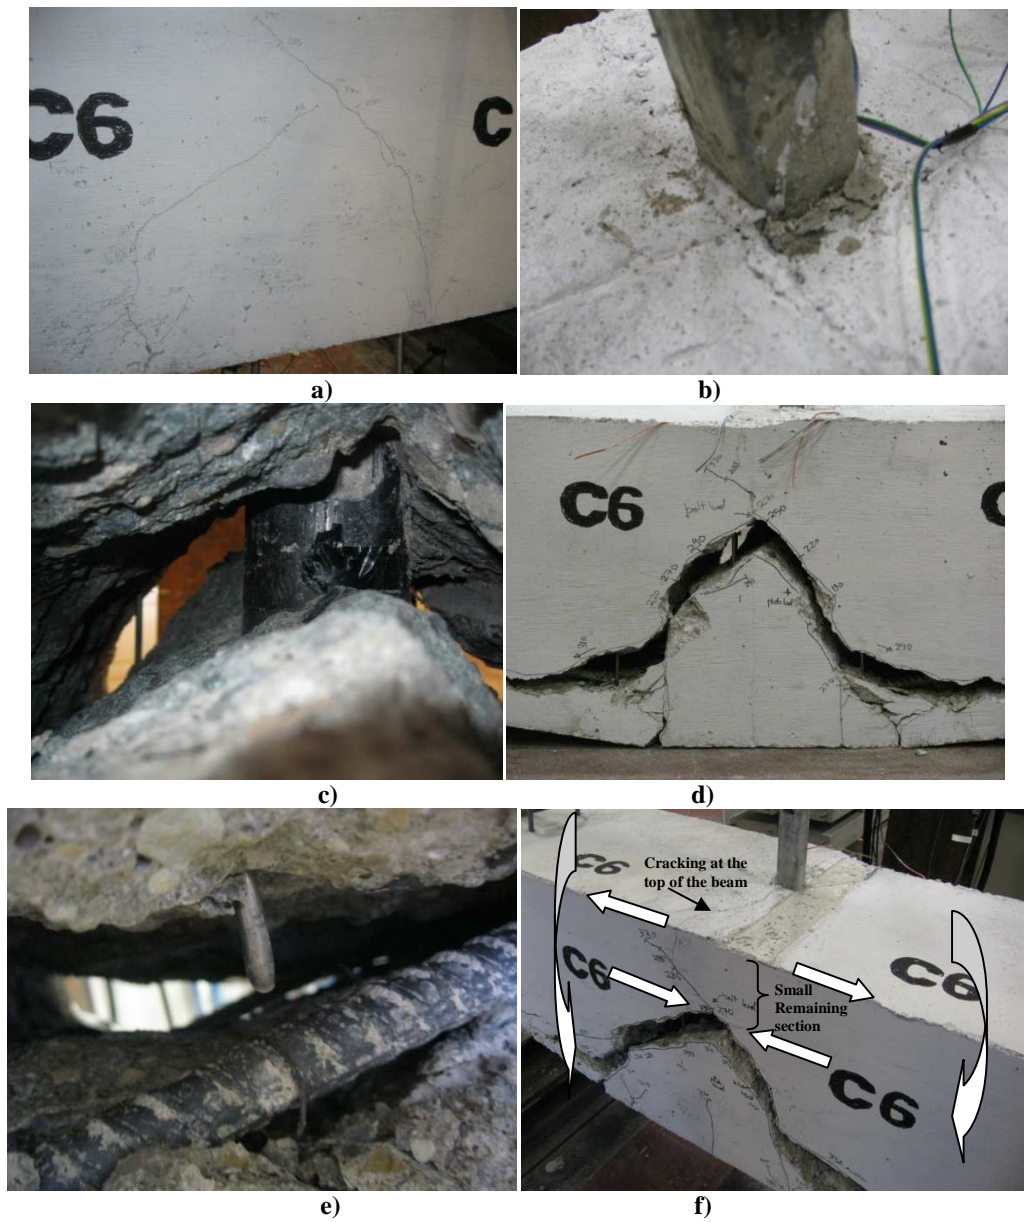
6 a) flexural shear cracks initiation and propagation; b) Bond failure between the pile shaft and the surrounding concrete; c) Initiation of the breakout cracks under the bolt; d) Breakout cracking and the breakout cone formation; e) Stirrups failure by necking; f) Tension cracks initiation after the stirrups failure on the other side of the beam
